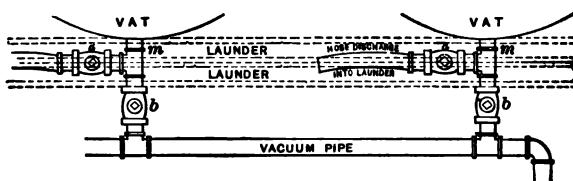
PLAN OF VACUUM AND DRAINAGE PIPES.
